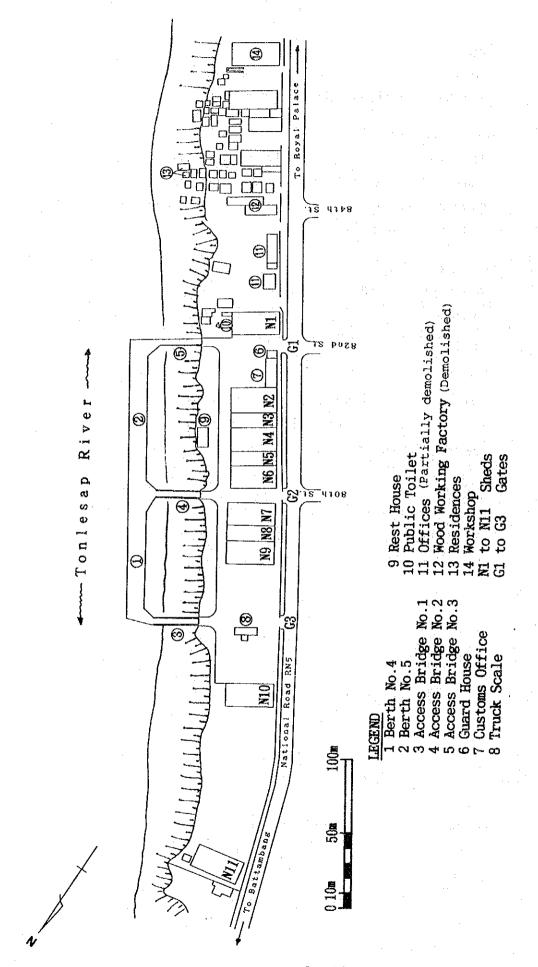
Plan of Existing Facilities of Phnom Penh Port No.1
